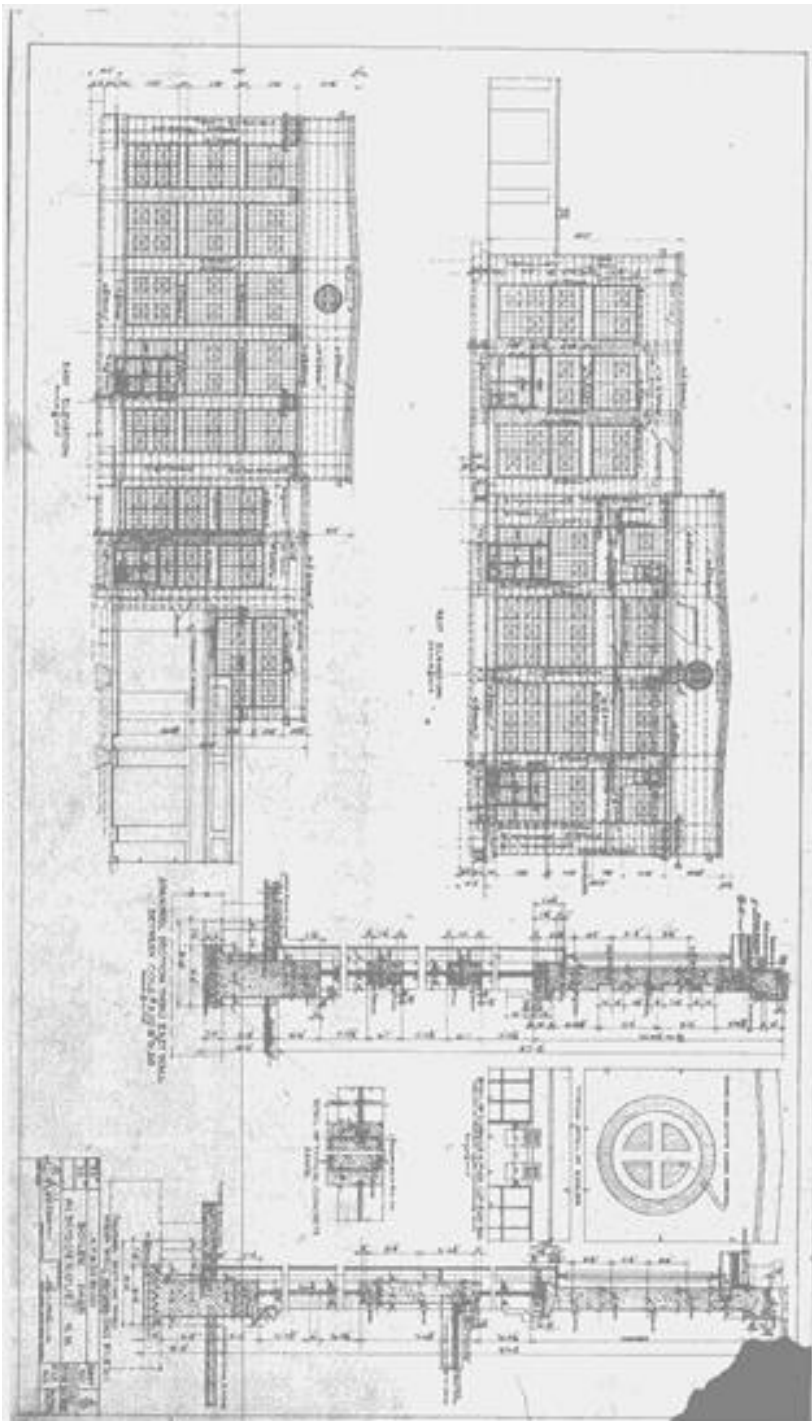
East and west elevations of boiler shop. AT&SF Engineers, drawing c.1922
